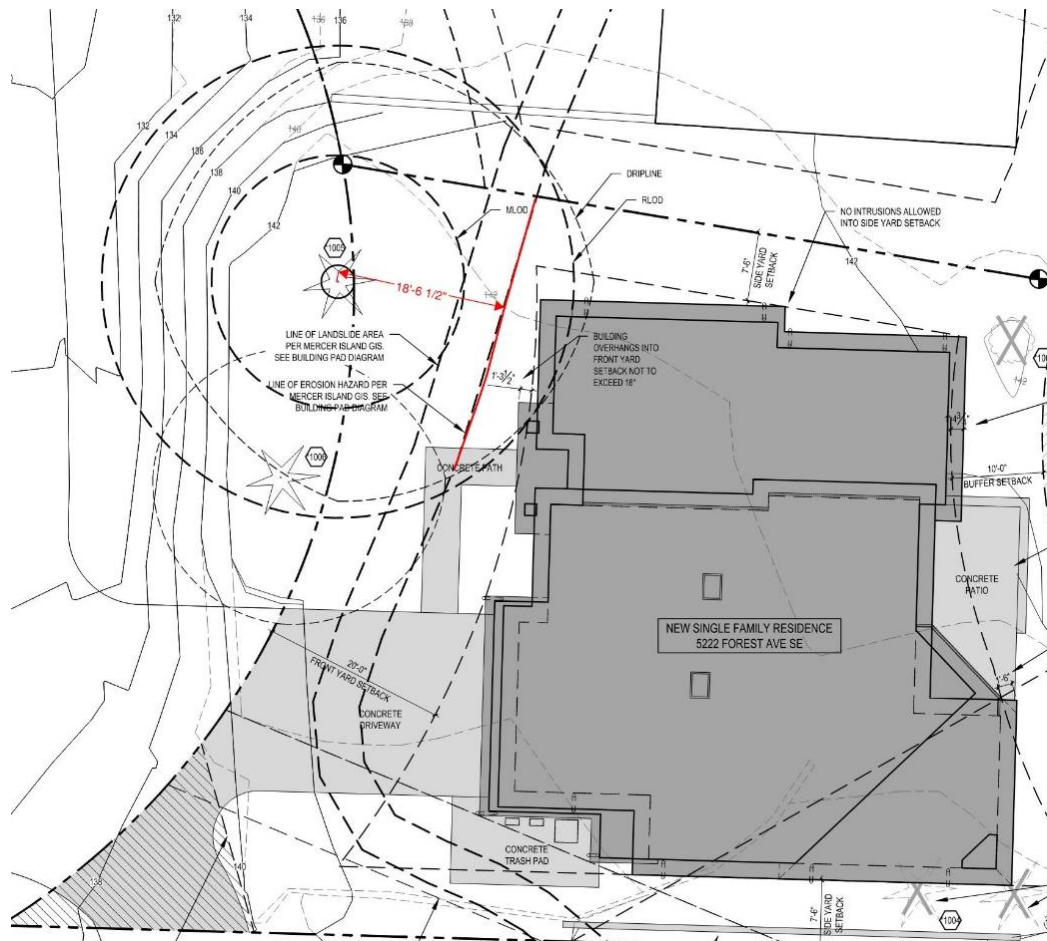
Snip of the provided site plan (Site Plan A1.1, Sturman Architects, 05/14/2024). The approximate location of the excavation performed is indicated by the red line.
